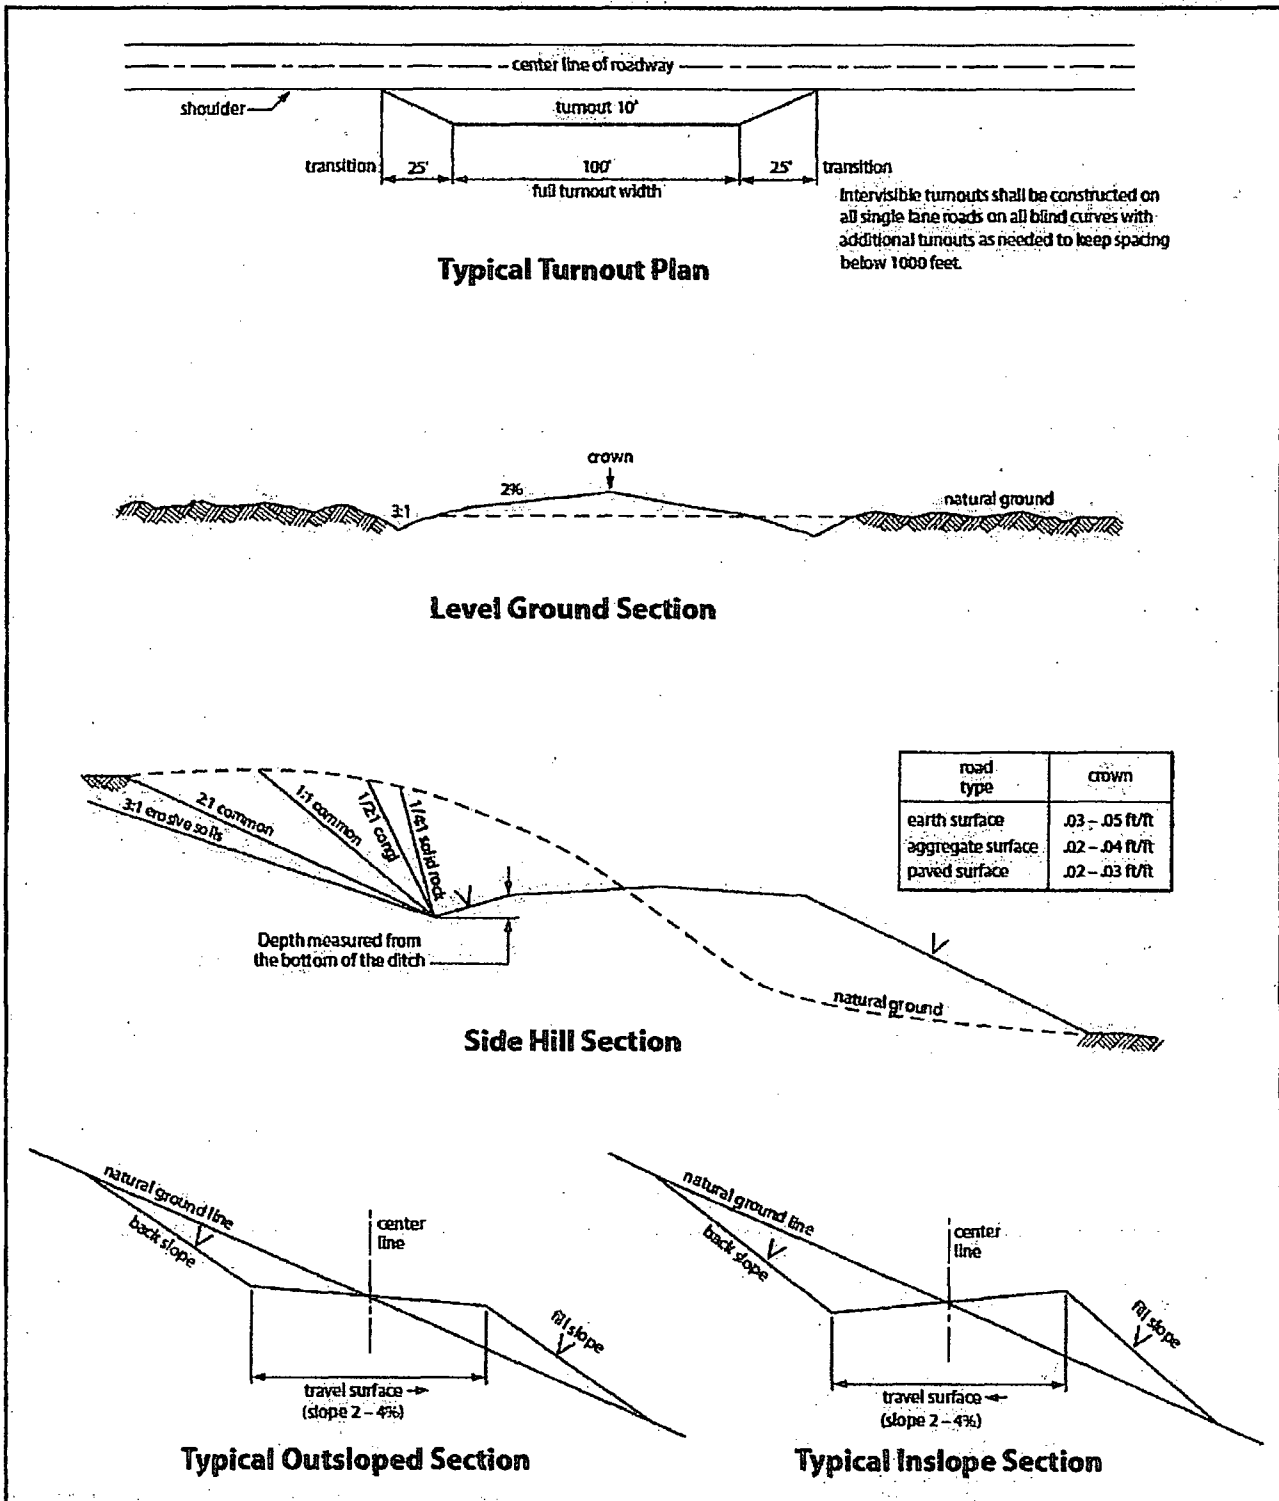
Cross-sections and plans for typical road sections representative of BLM resource or FS local and higher-class roads.
